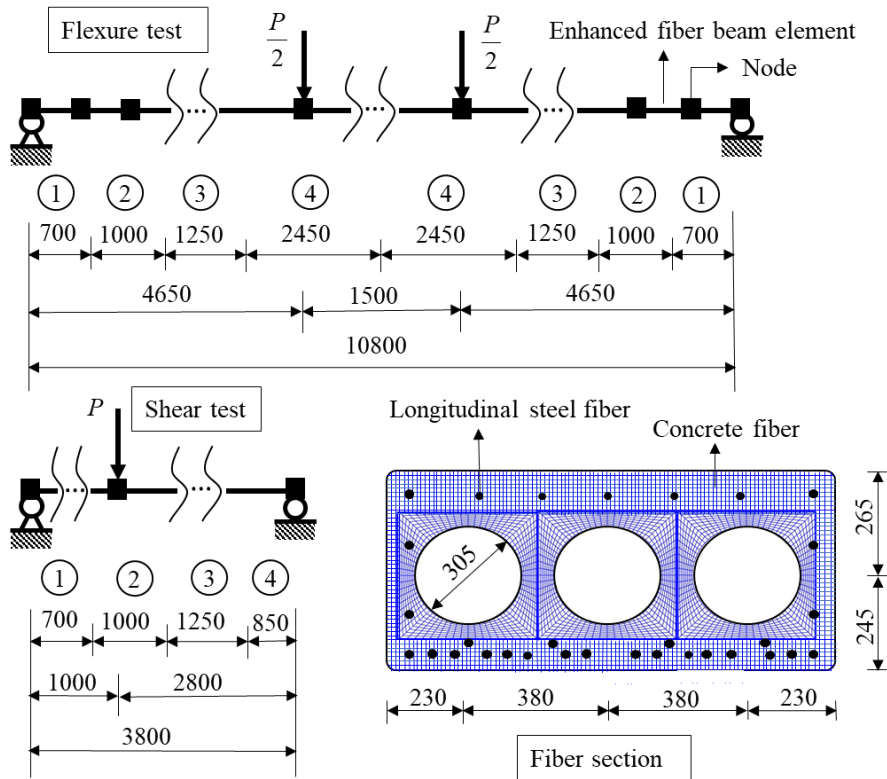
FE models for the tested PC girder (Unit: mm)
